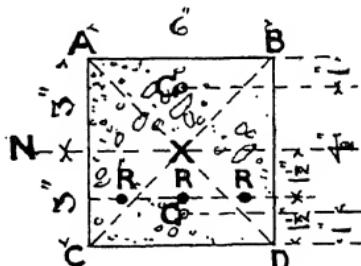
Section of Concrete Beam with Three Iron Tension-rods.
